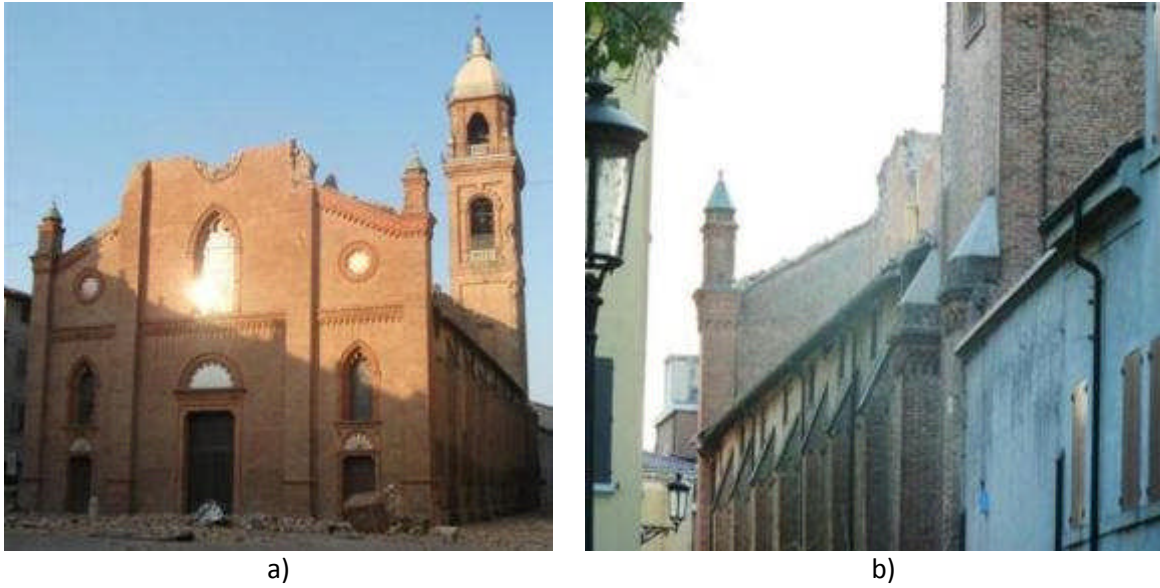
Cathedral of Santa Maria Maggiore in Mirandola: a) collapse of the gable of the façade; b) collapse of the roof.
